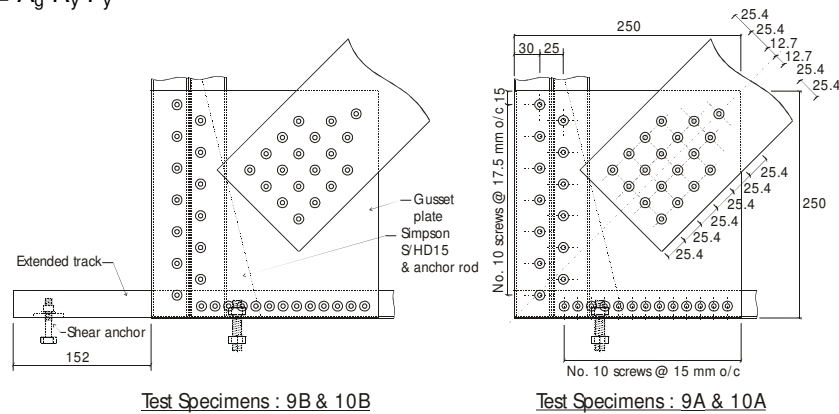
Schematic drawing of medium strap braced test wall corner details (mm).
